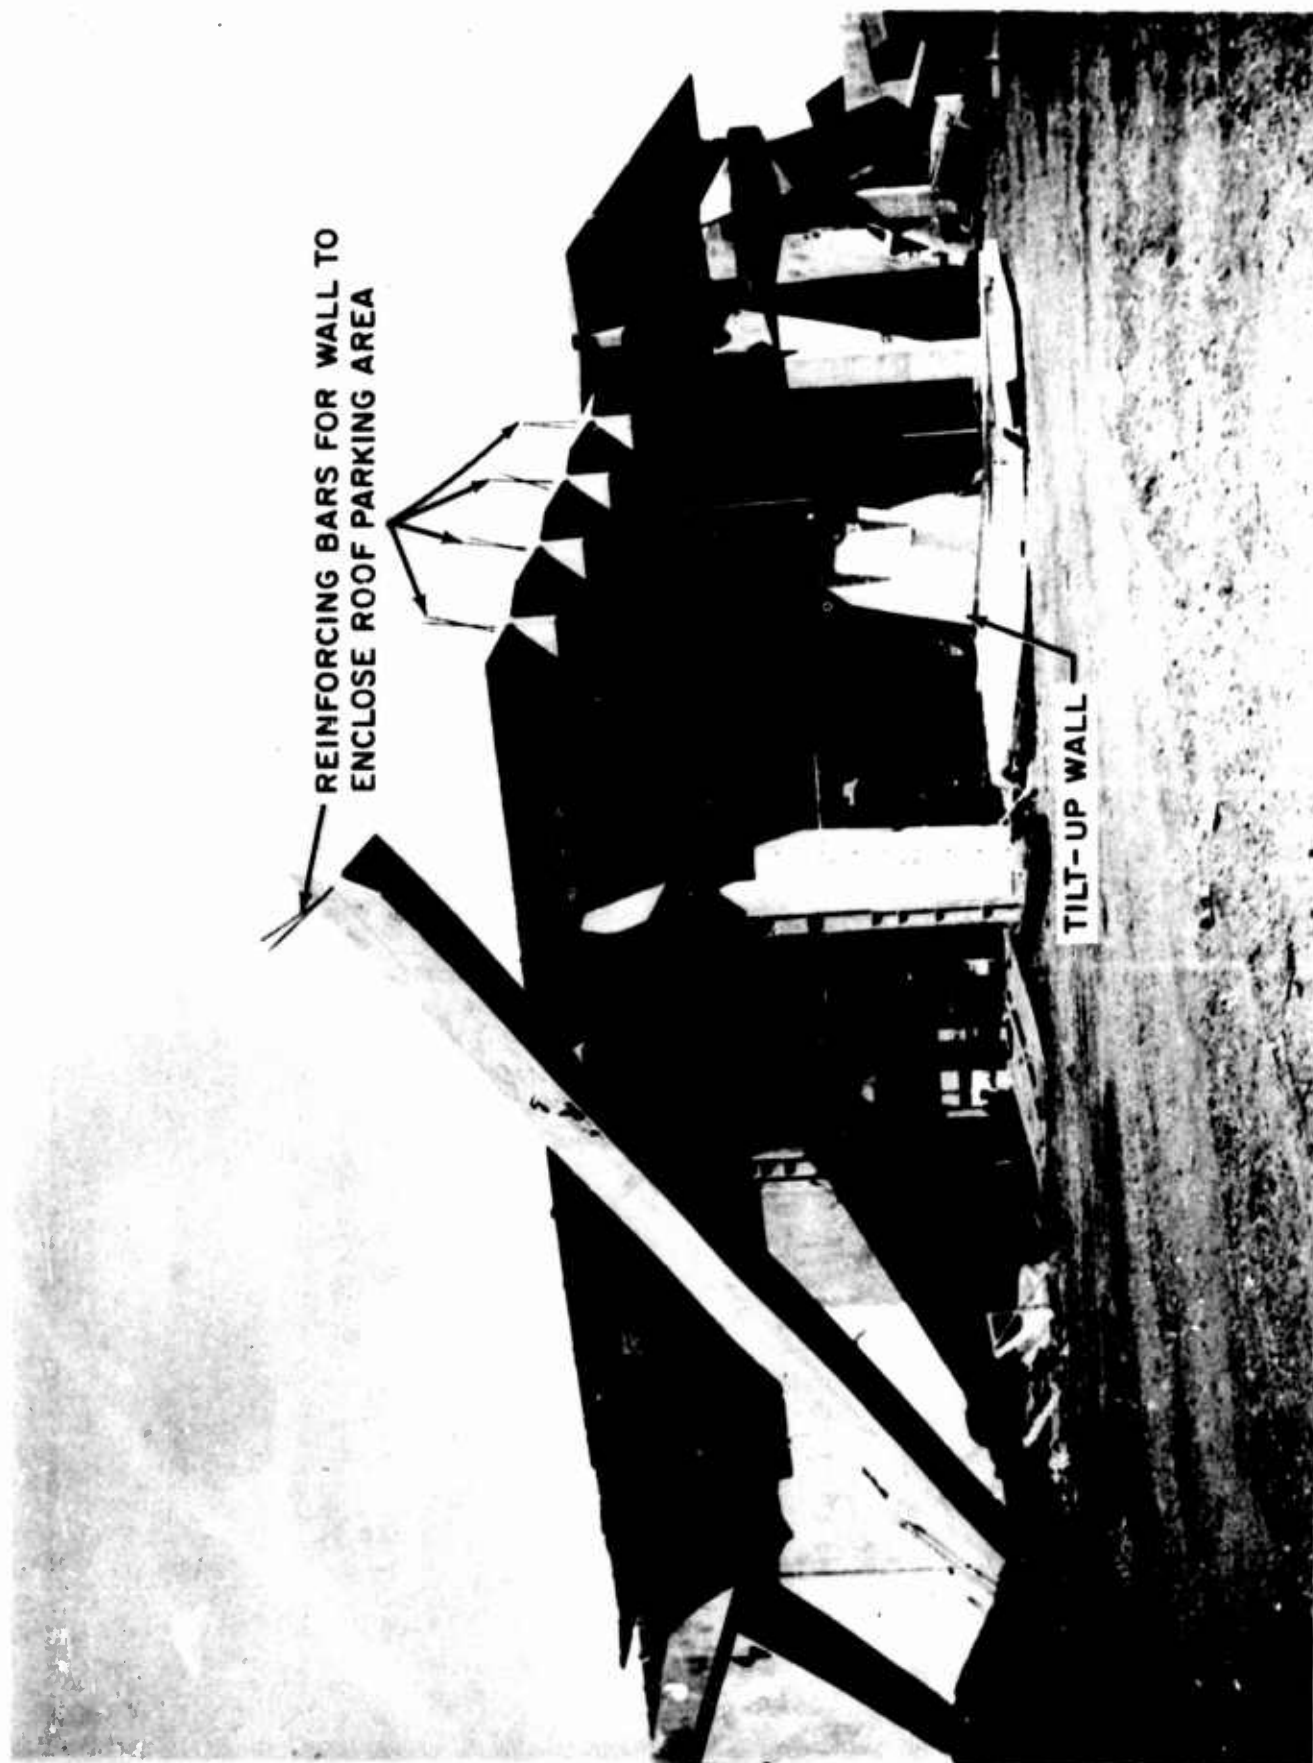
Alaska Sales and Service Building (Southwest corner of the unfinished structure showing fallen prestressed T-roof beams and tilt-up sandwich-wall panels)
